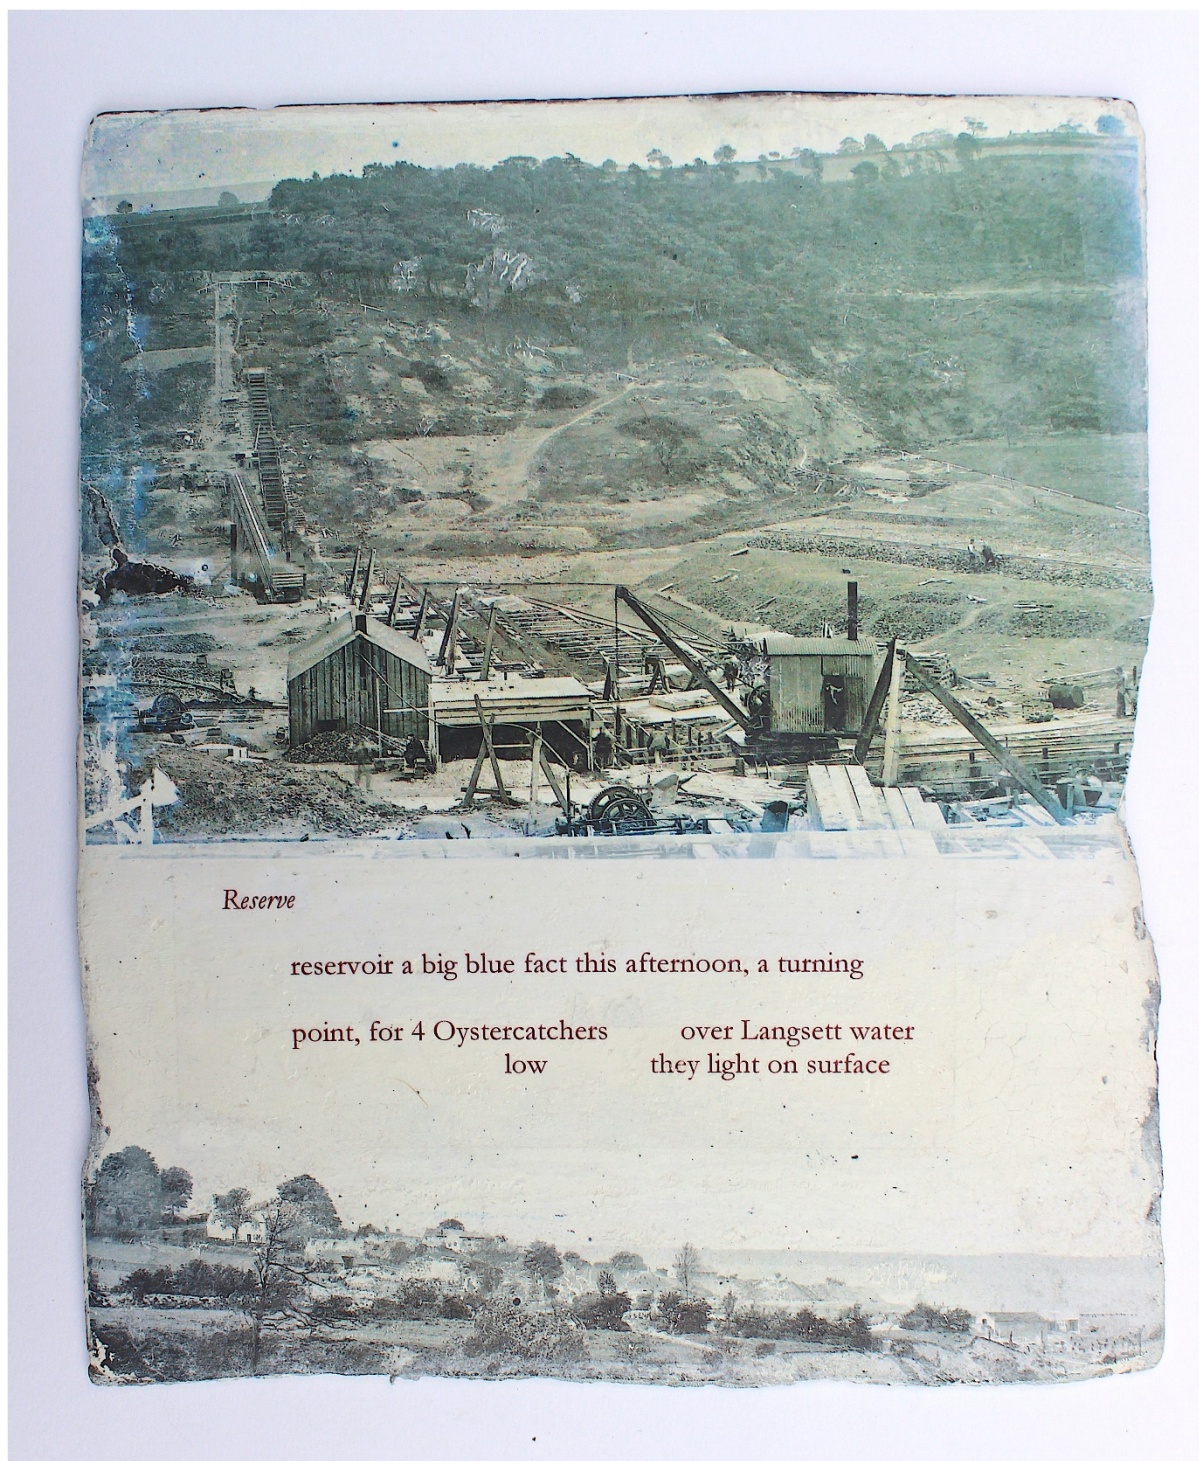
Reserve: Langsett Reservoir dam wall under construction.
